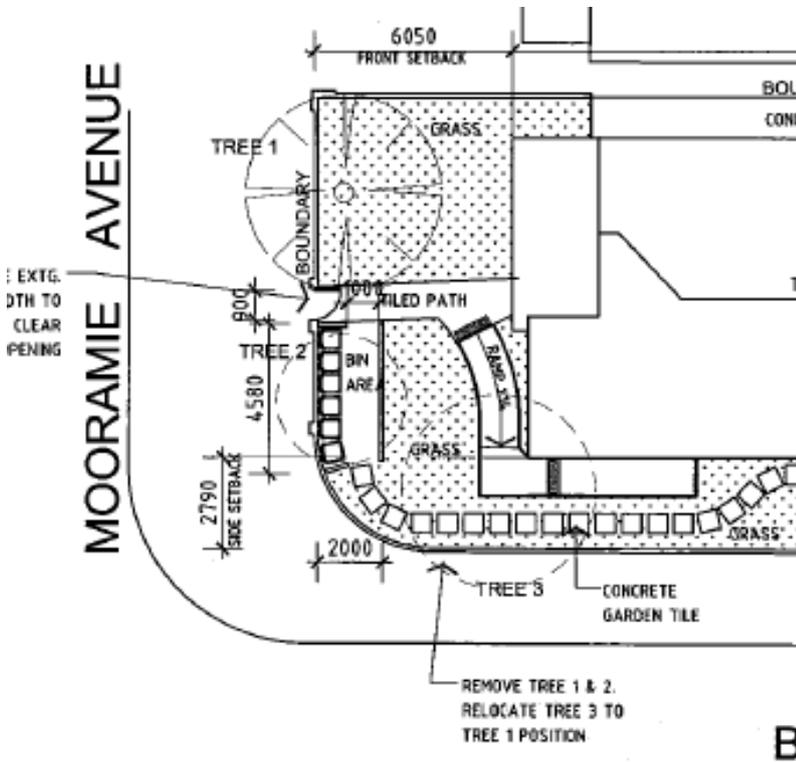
Extract of site plan showing tree removal (source: New Era Design)
